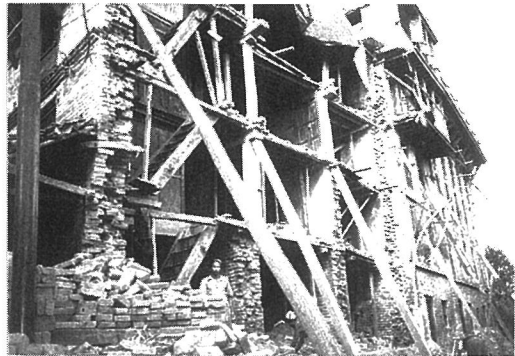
Collapse of the gable wall of a brick masonry building; example 1, Bhaktapur, Nepal
